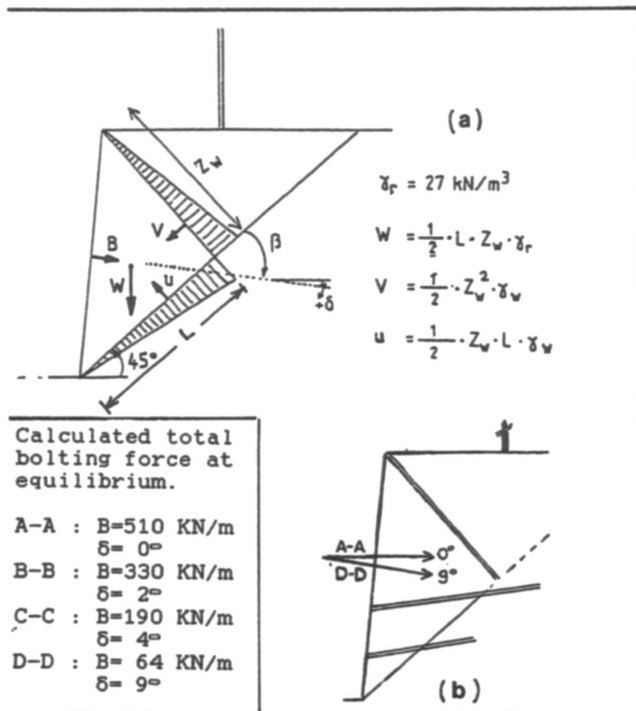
Illustration of (a) assumed slope geometry forces for bolt design (active pressure from upper slope-half considered equal to zero); (b) recommended bolt direction and position of drainage holes
